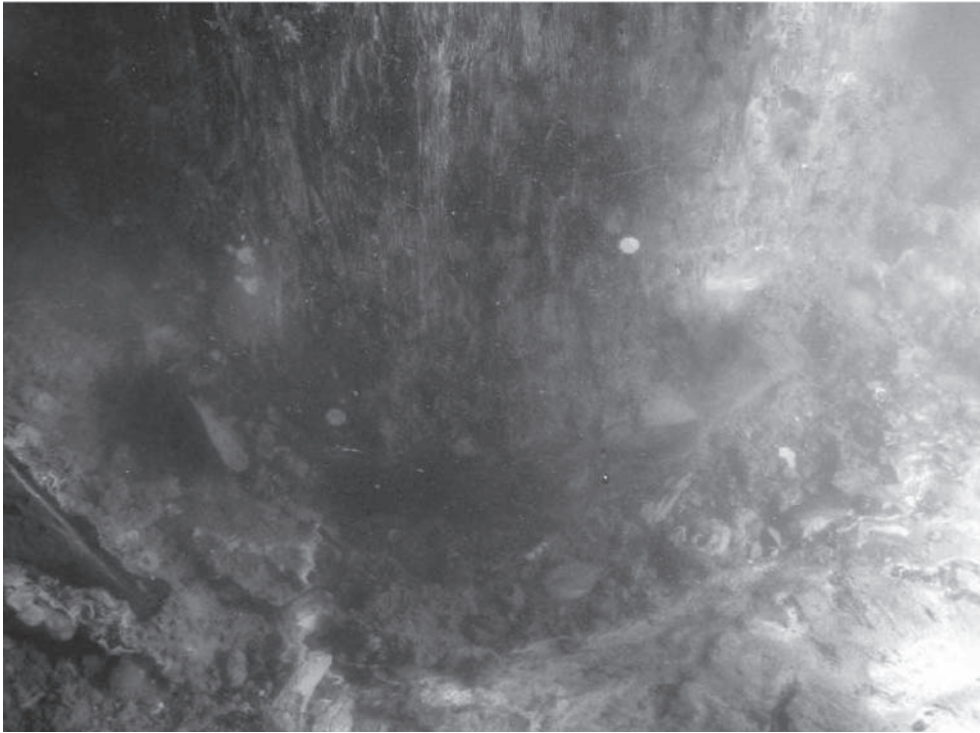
Dumbarton pier 6, Northwest caisson, SE Quadrant, large spall with exposed timber pile.
